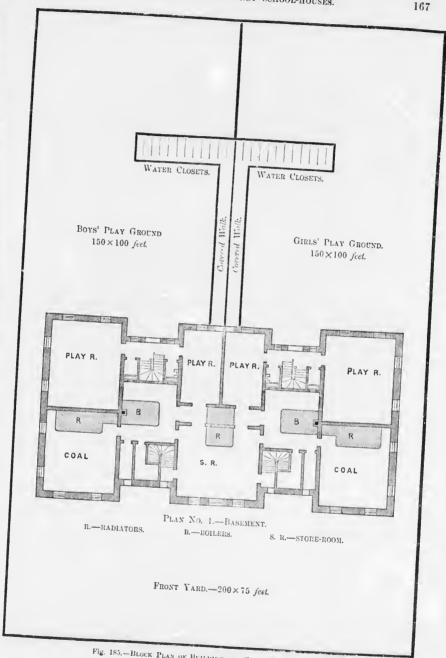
BLOCK PLAN OF BUILDING AND GROUNDS OF FIG. 181
